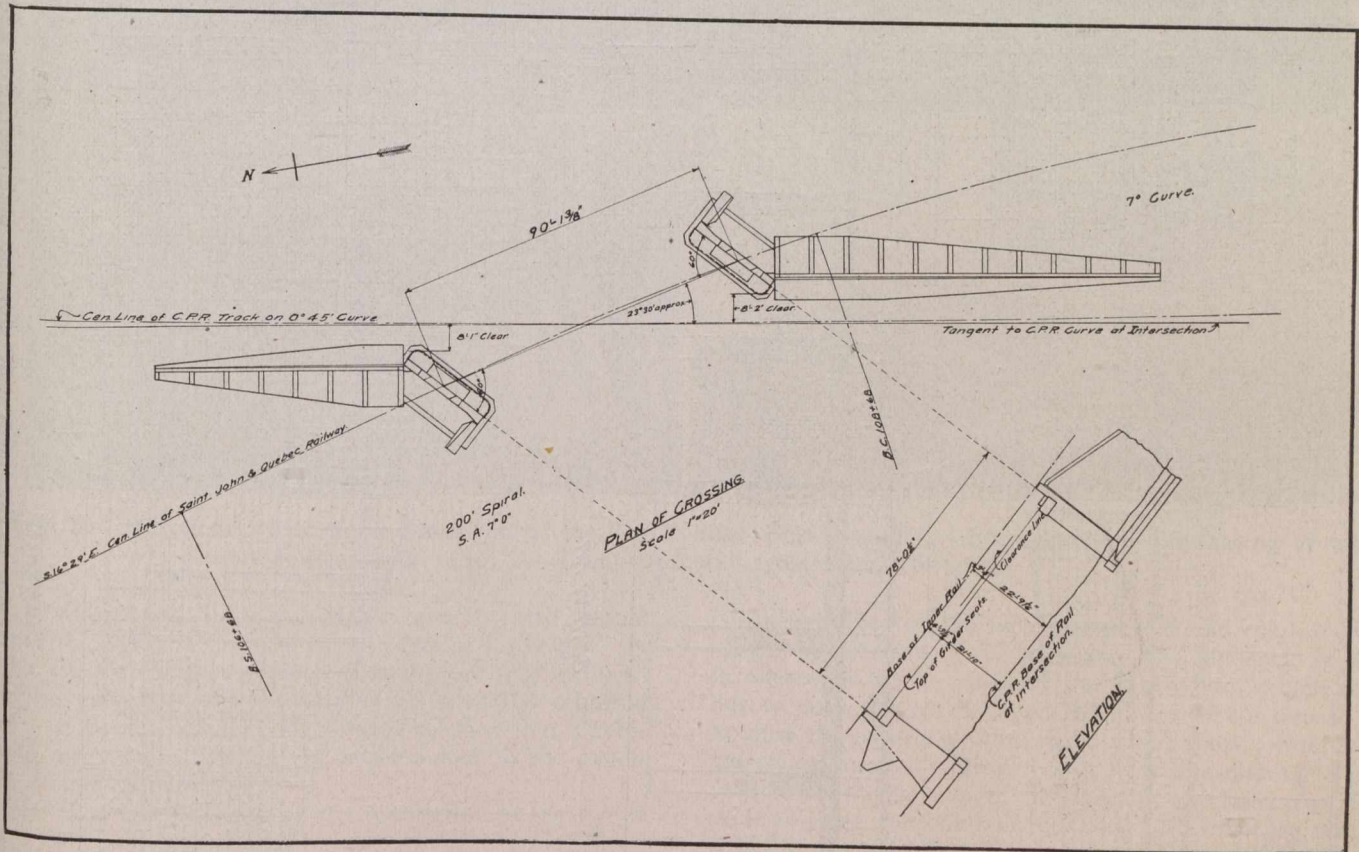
General Plan and Elevation of Crossing, Showing Alignment of Tracks.
